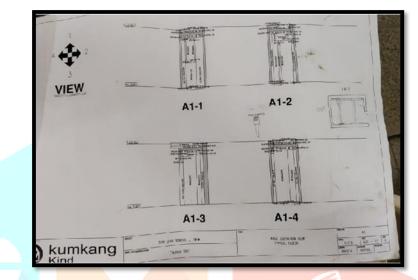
Mock-Up Shuttering Drawing – All walls.
